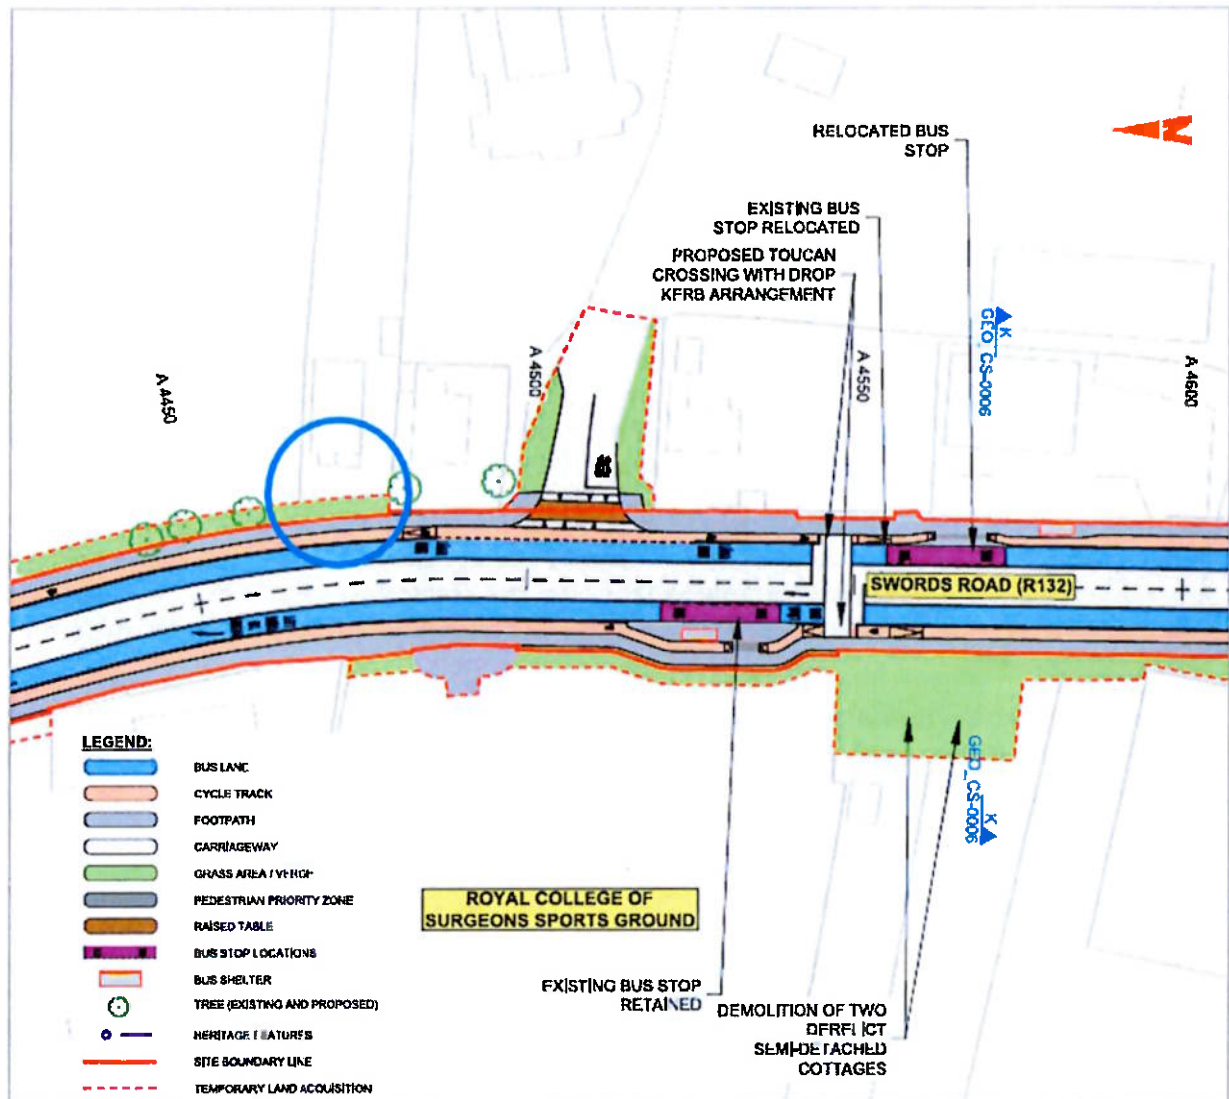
Extract of Sheet 13 of 37 'Swords to City Centre Core Bus Corridor Scheme - General Arrangement' (source: www.busconnects.ie, downloaded July 2023)
